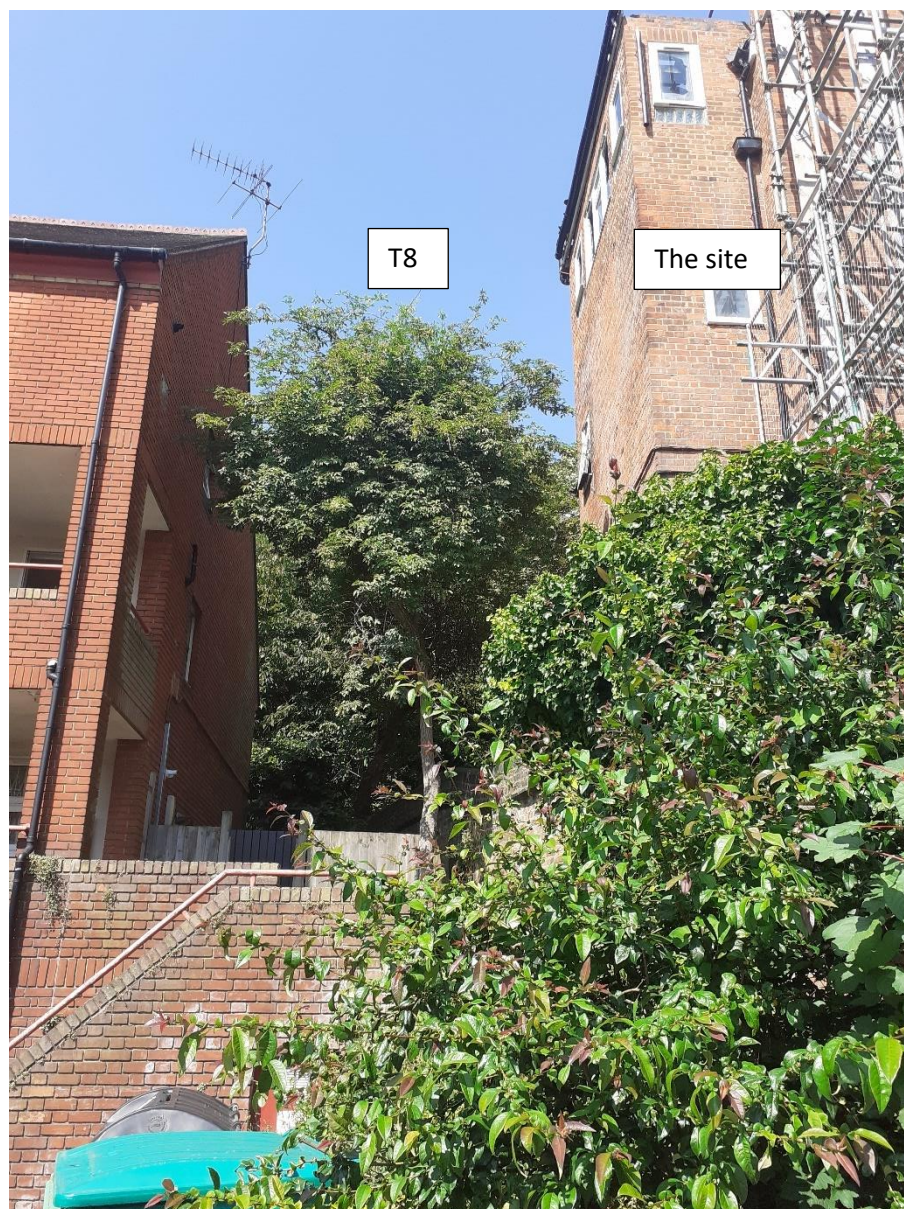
of T8 looking from the car park for 31a Daleham Gardens, looking west
